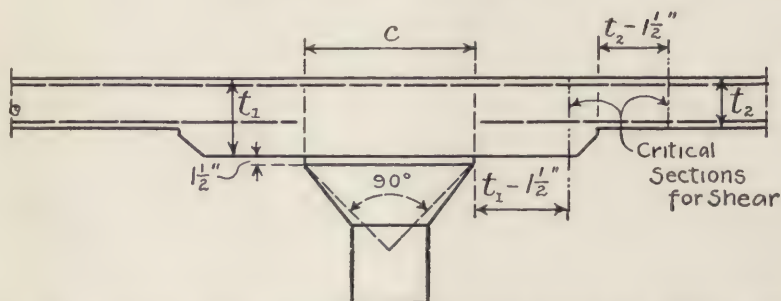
Typical Column Capital and Sections of Flat Slab with Dropped Panel.
